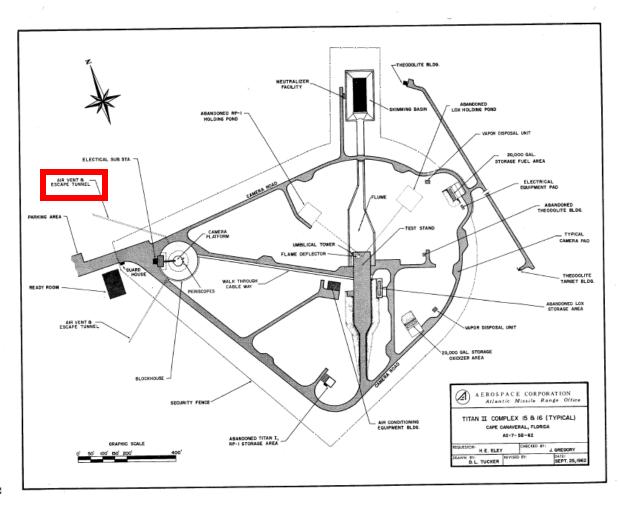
AMRO Engineering Staff (1962:51) LC 15/16 Plan View. Escape tunnel highlighted in red (Figure II.26).
